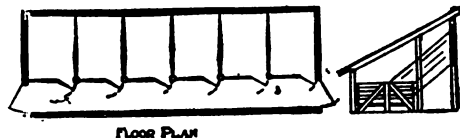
Plan and section of shed roof community hog house with feeding alley, single row of pens and windows in front.
